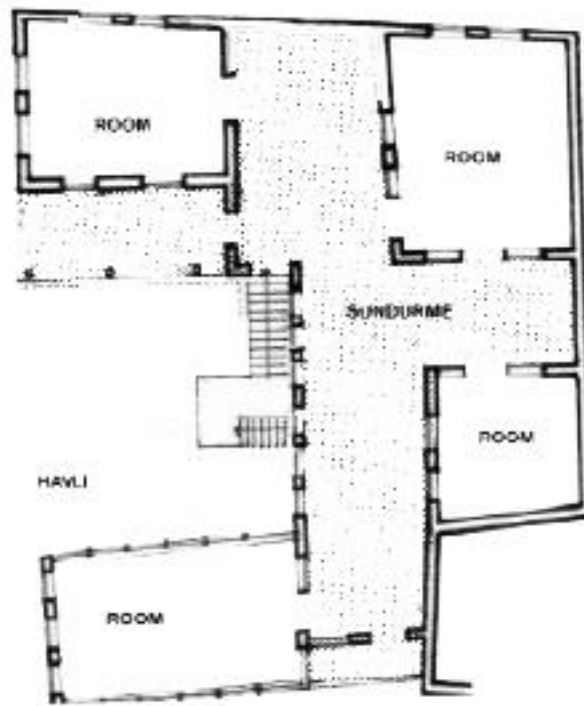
The Sample of Ottoman House's Layout (Pulhan, 2008)
